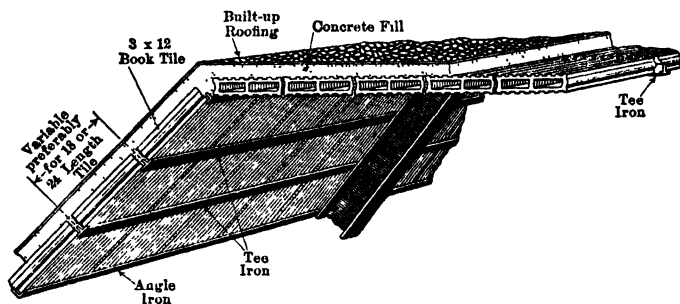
Standard Book Tile in the Construction of Light-weight Fire-proof Roofs
